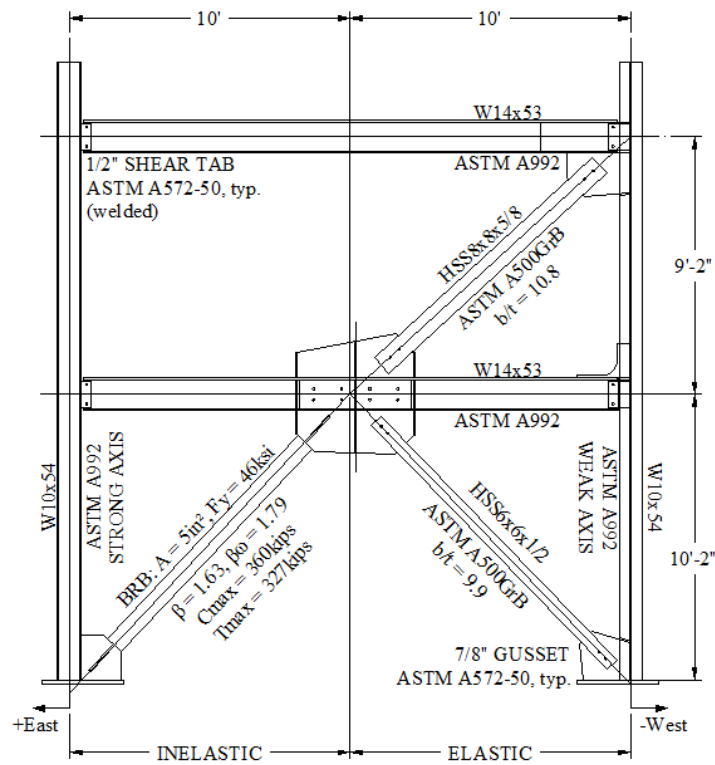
Test specimen schematic with dimensions, materials, and member sizes: NCBF-B-3SB.
